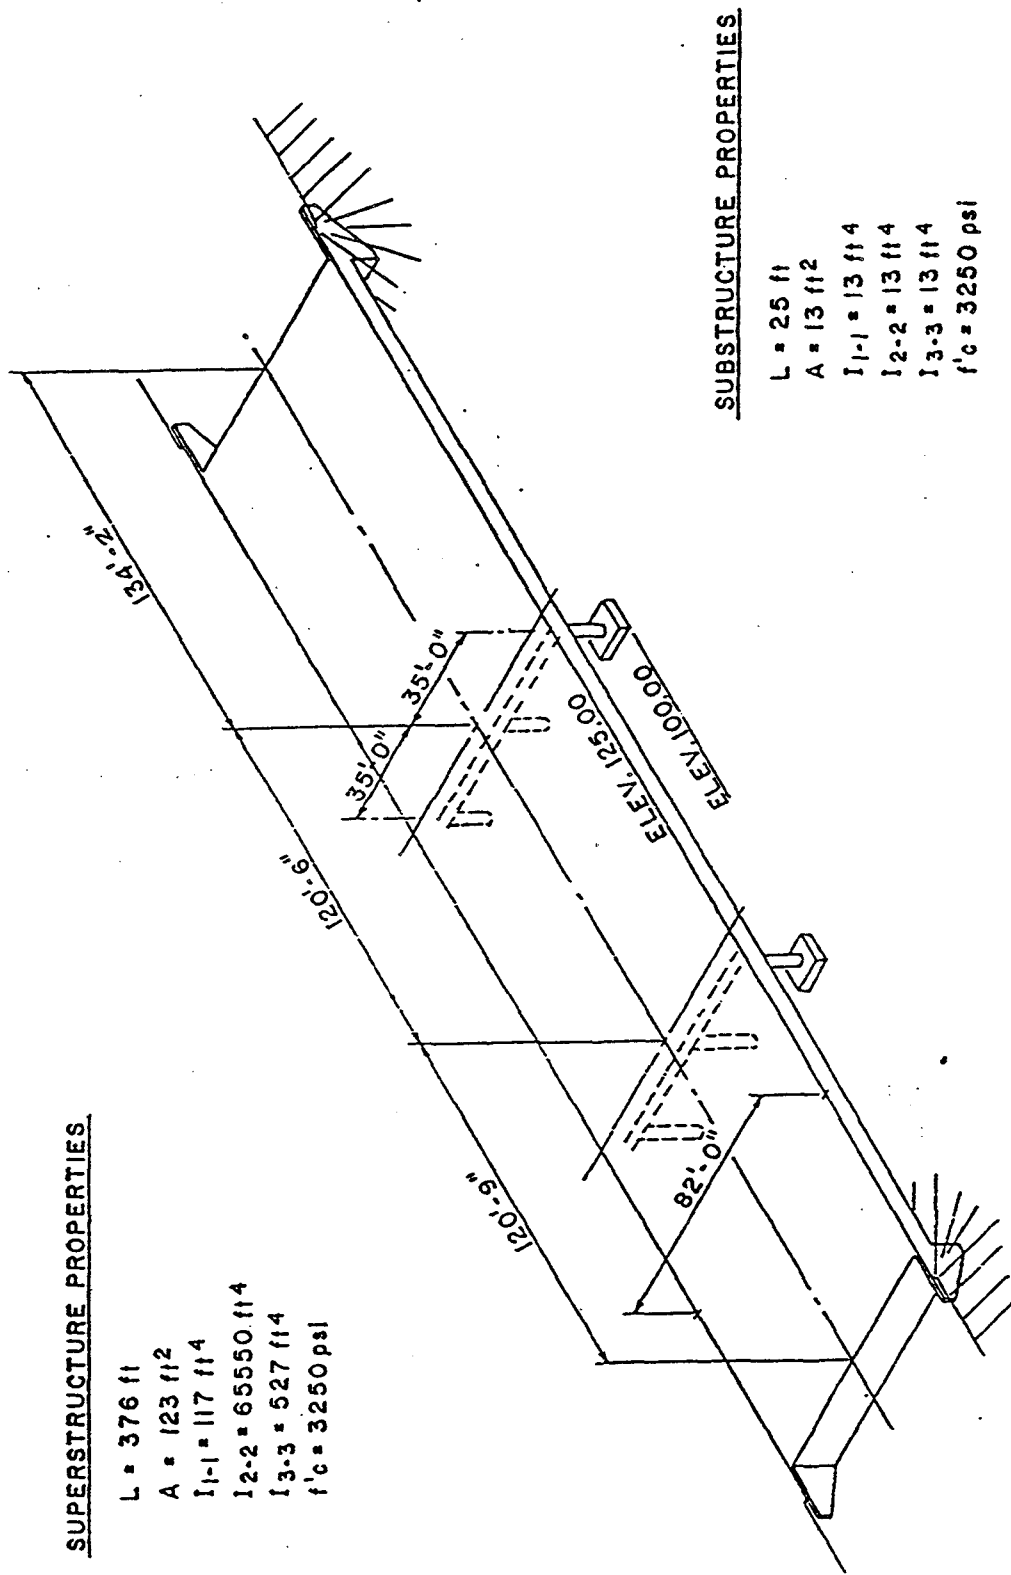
Elevation of Three-Span Bridge and Super- and Substructure Properties
